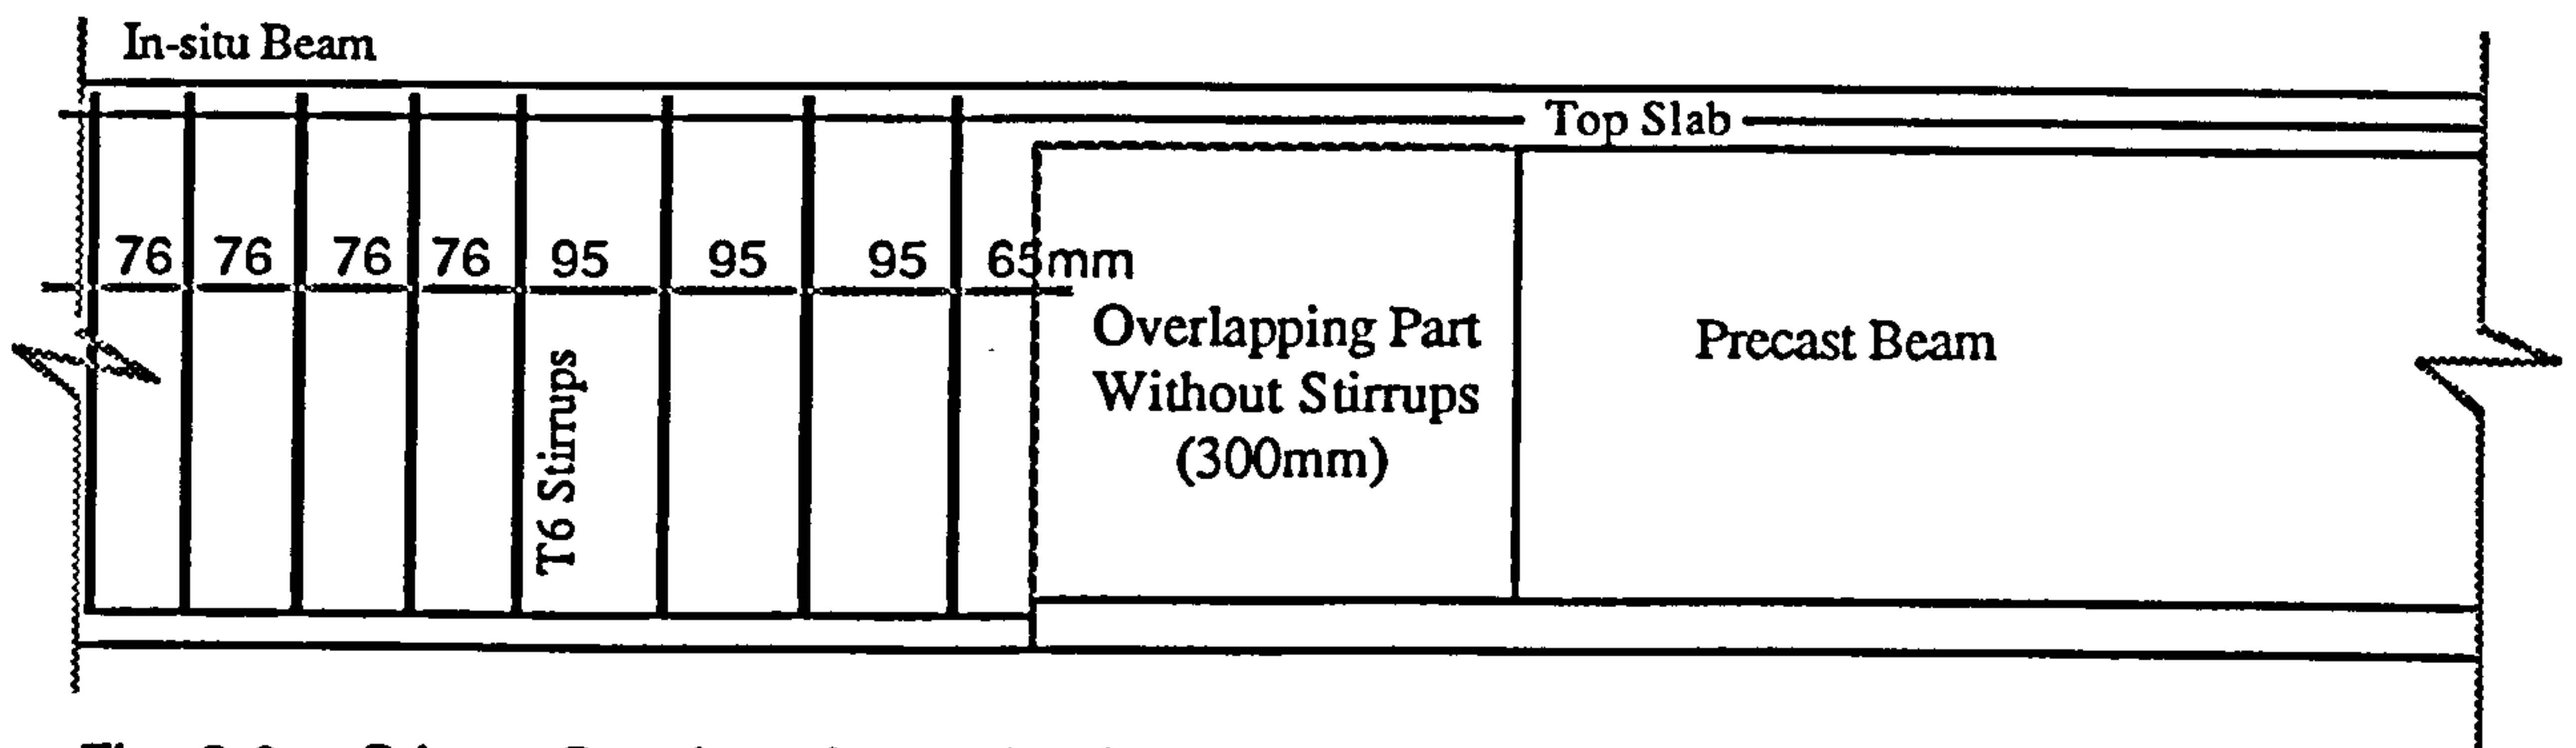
Stirrup Spacings in the In-situ Beam , Tests E30AB3 and E30BC4 (Without Stirrups in the Nibs)
